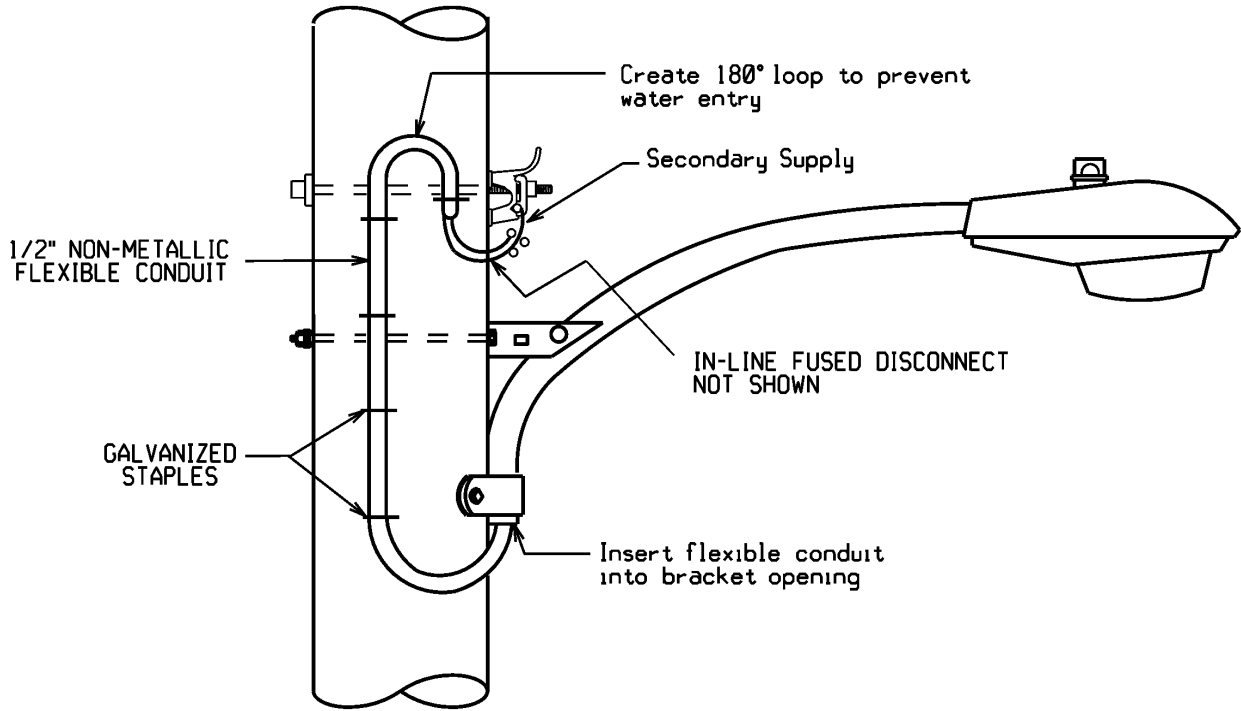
Mechanical Protection for Overhead Supplied Outdoor Light Fixture Conductors
